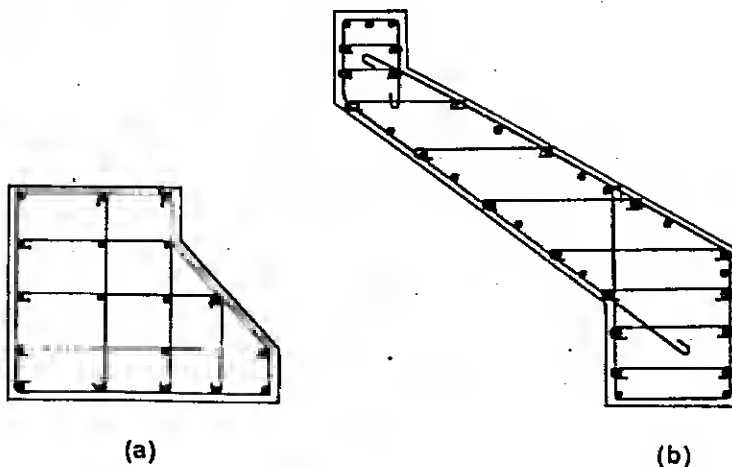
Typical Reinforcement in Base Slab of a Framed Foundation.
